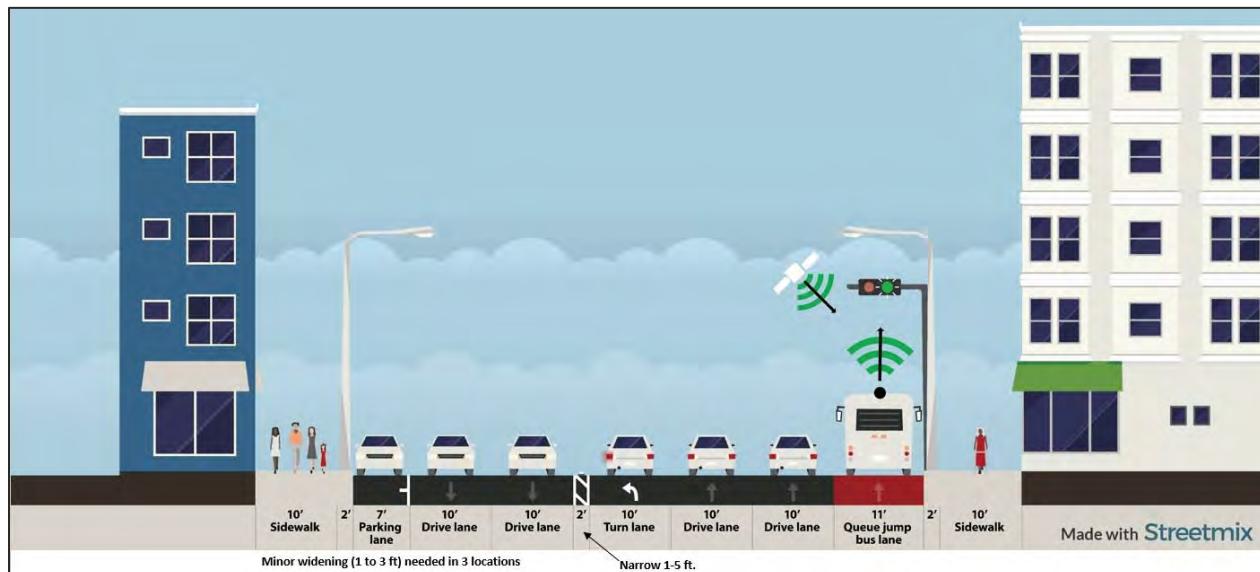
ALTERNATIVE 1 TYPICAL INTERSECTION CROSS SECTION
